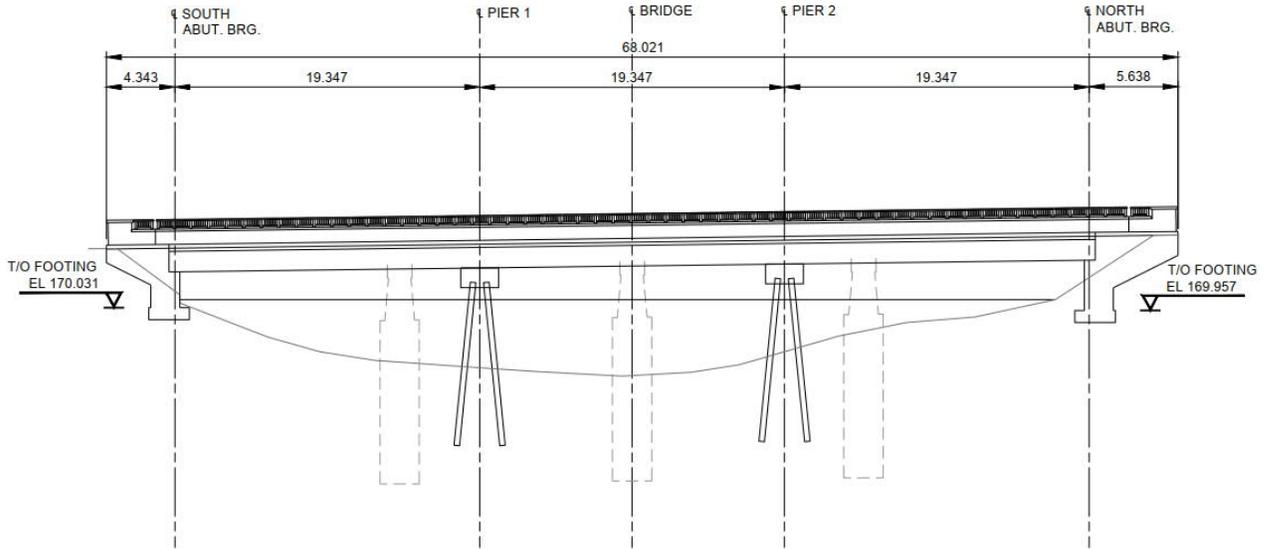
Proposed Elevation for Alternative Design Concept 3
